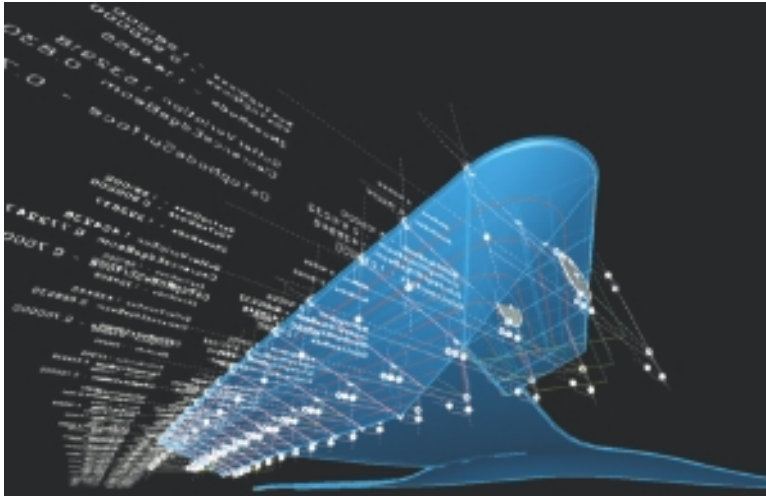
Beijing Airport, parametric model of cantilevered edge detail. (Image credit and copyright Foster + Partners.)
